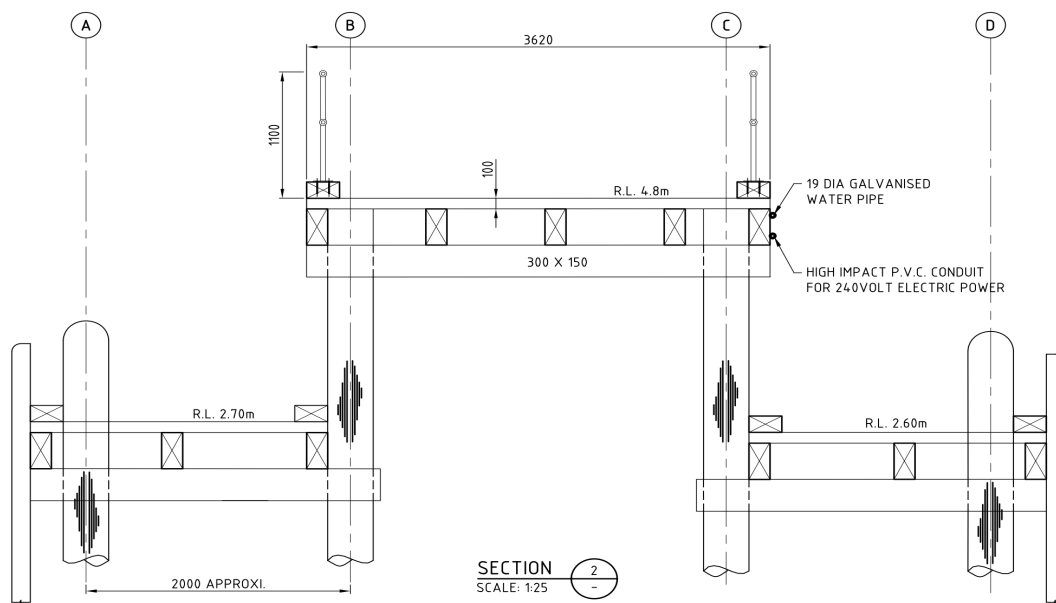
Timber Pier Typical Cross-Section (Lower Landing locations)
